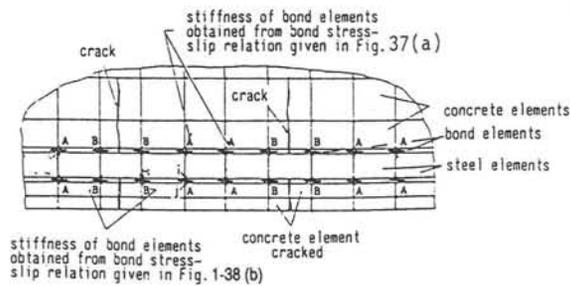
Representation of Bond in Cracked Reinforced Concrete Beam (Plauk, 1981)
